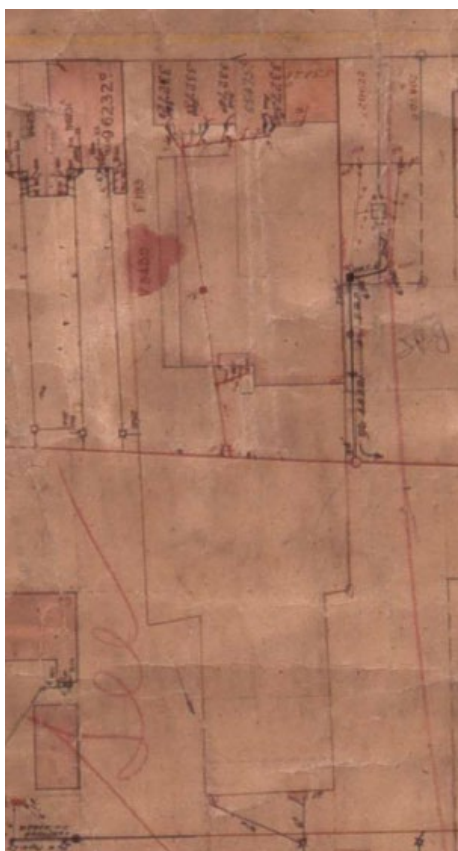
Detail from Blackwattle plan depicting the footprint of two interconnected buildings along the George Street alignment and a large building to the south with an awning stretching along the western extent. (Source: Sydney Water Archives)
